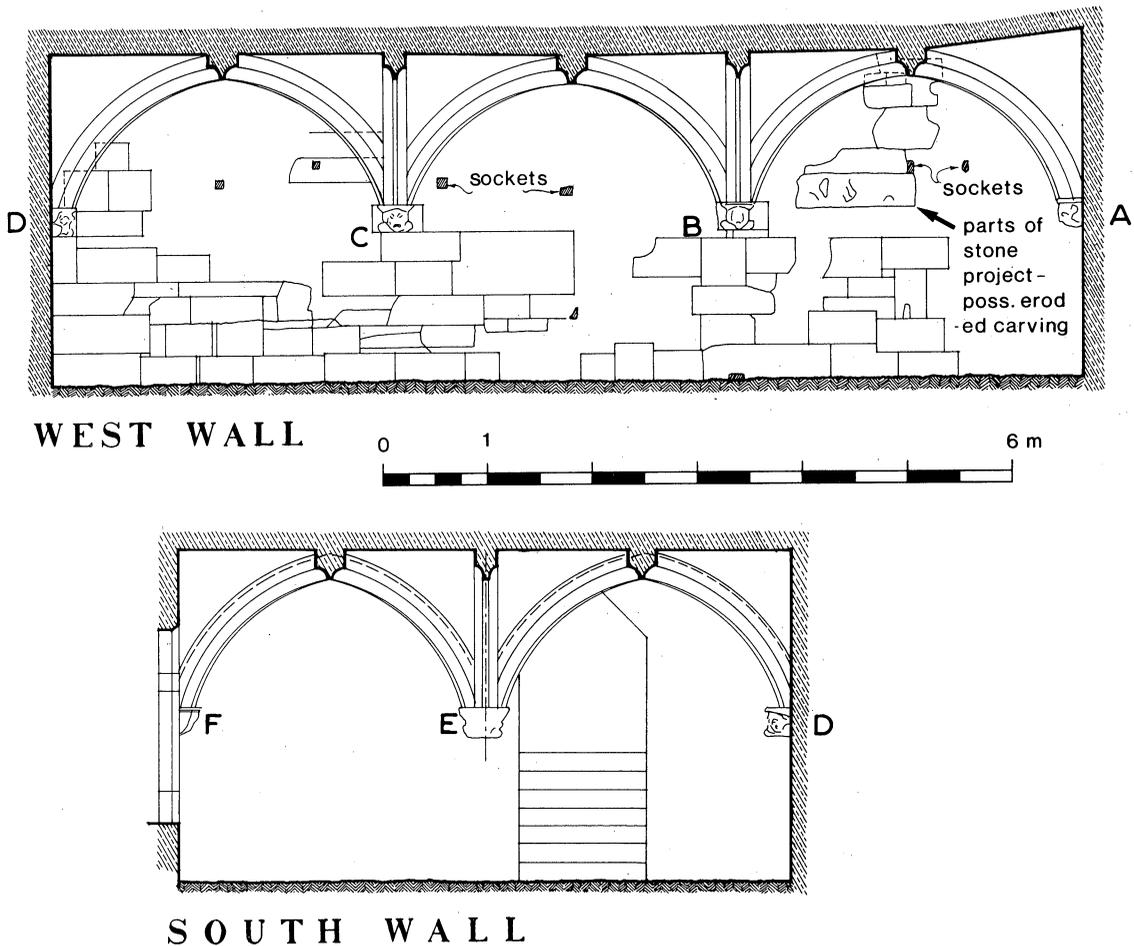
72/74 High Street, Guildford, West and South Walls of Undercroft
